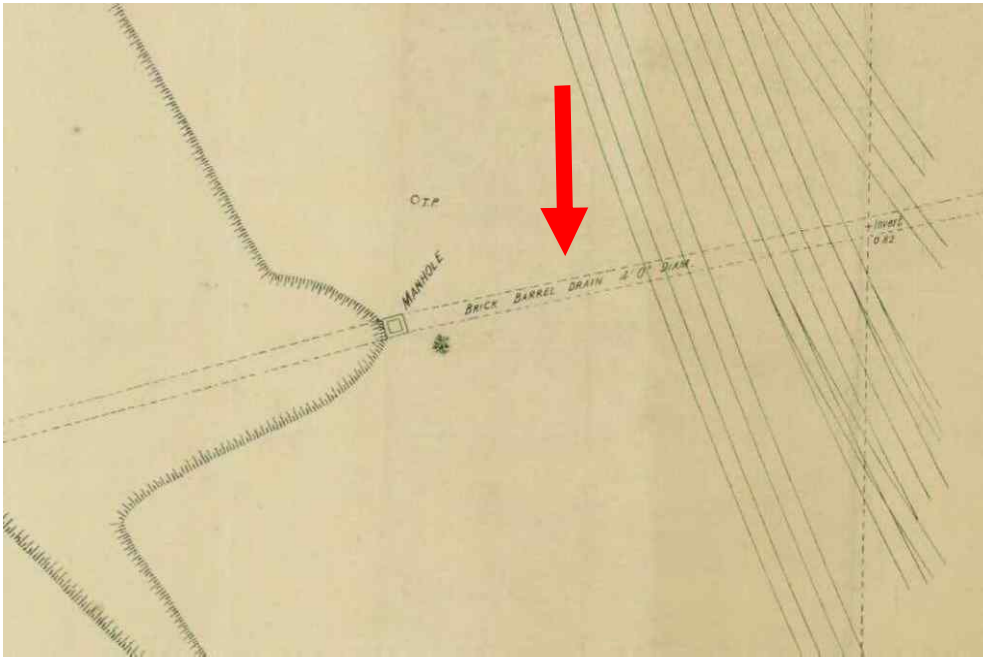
Part of MMBW detail plan no. 701, 1897, showing 'brick barrel drain 4'0" diam.' (indicated)
